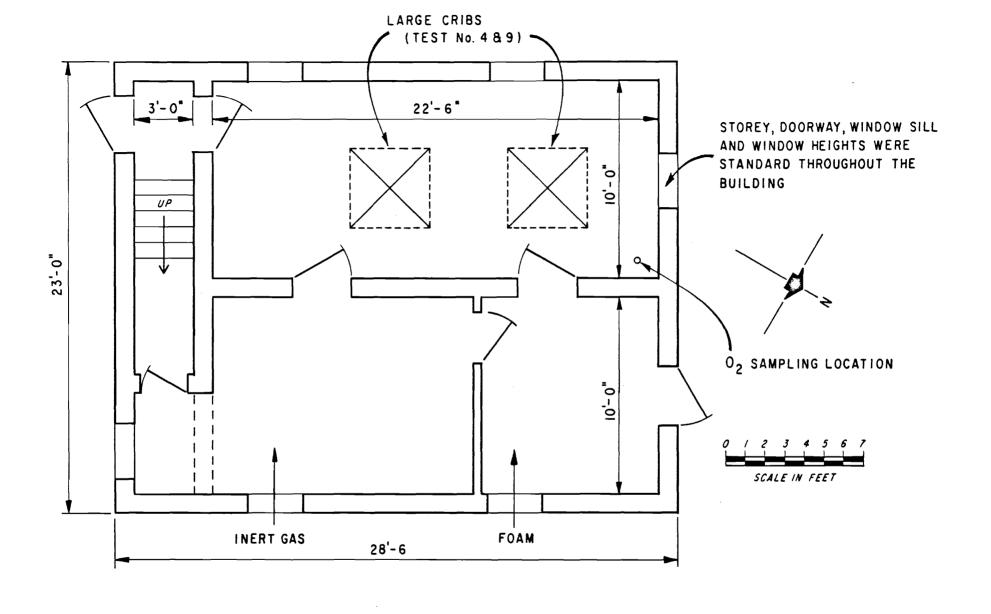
GROUND FLOOR PLAN, FIRE TEST BUILDING GRAVENHURST
